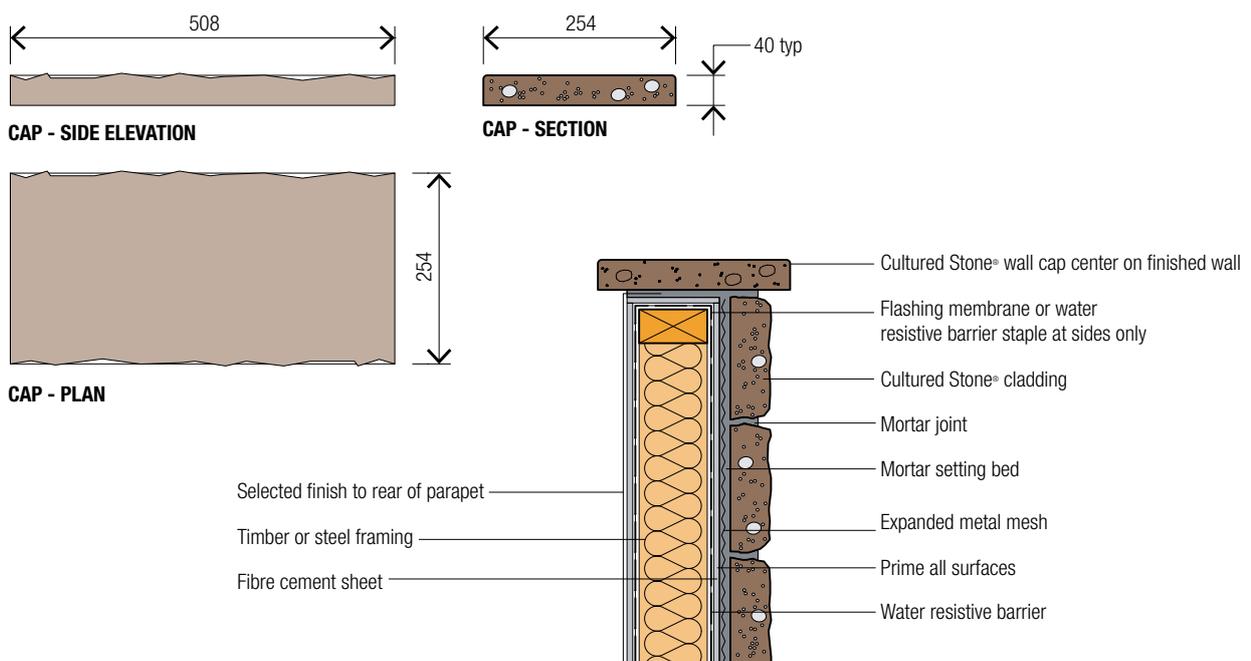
Timber Frame Parapet - Section (Dwg # CS-11.01)
